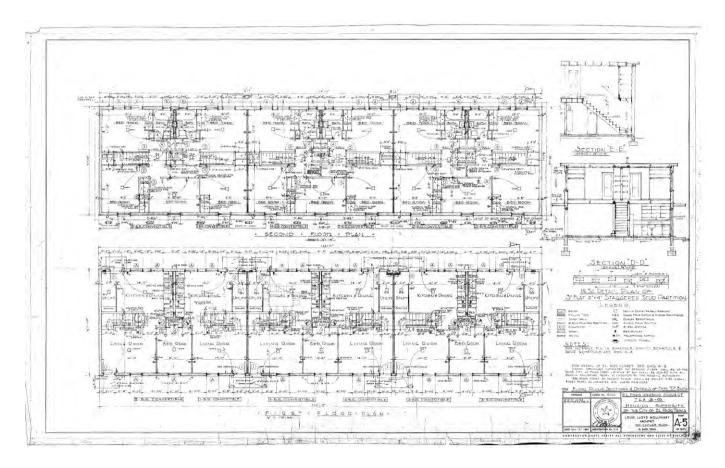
Ray Sherman Place – Original Floor Plans, Sections & Details of Type "D" Bldg. by Louis Lloyd Mollinary Architect, dated November 1951.
